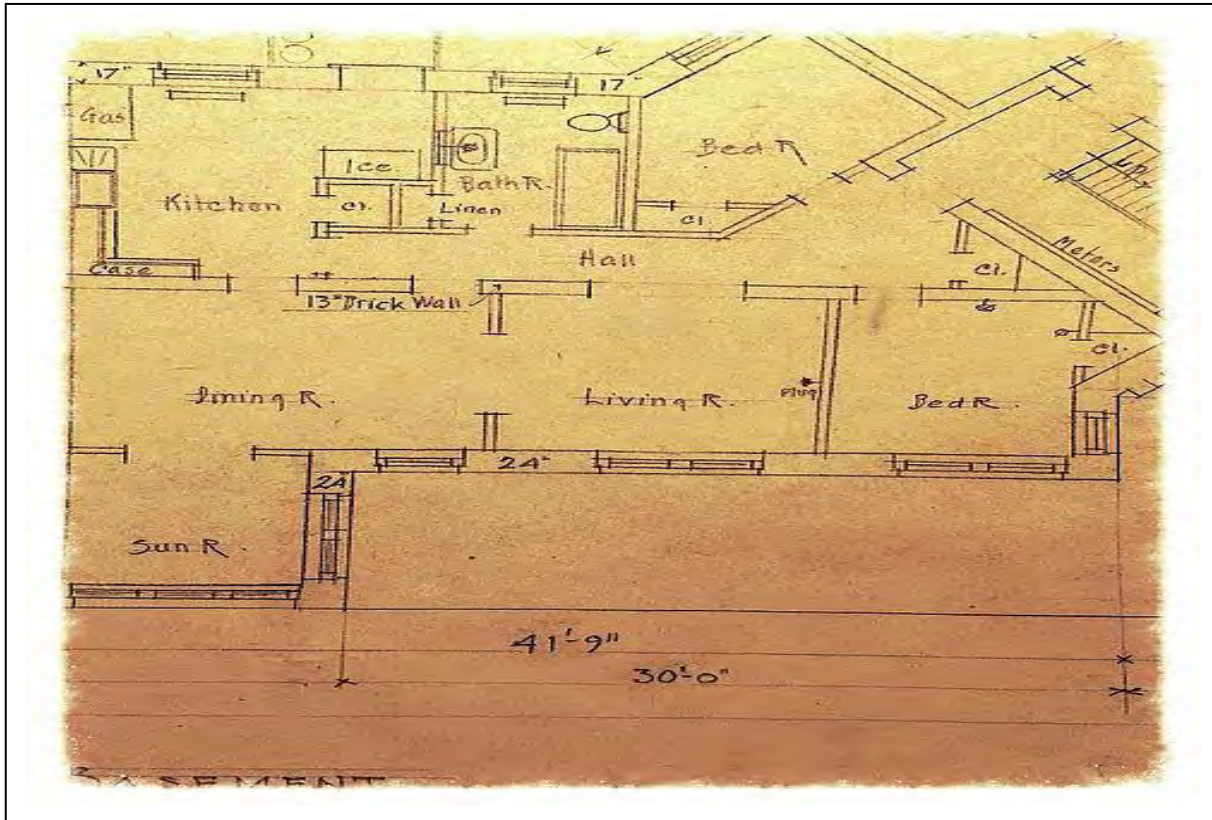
Original as built floor plan for the 1200 sq. ft. 2 bedroom units. (Pulled from original prints c.1915)
